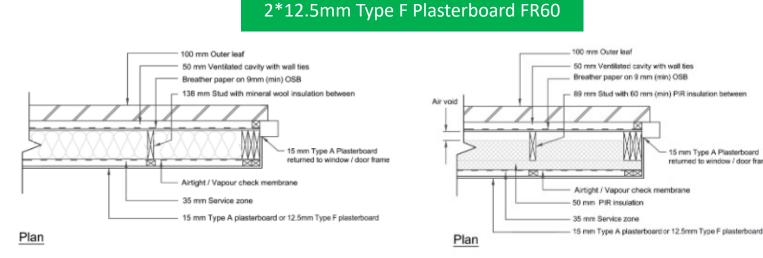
Wall Type 1 (WT1) - Service Cavity Wall Figure 3 Wall Type 3 (WT3) - Service Cavity Wall
